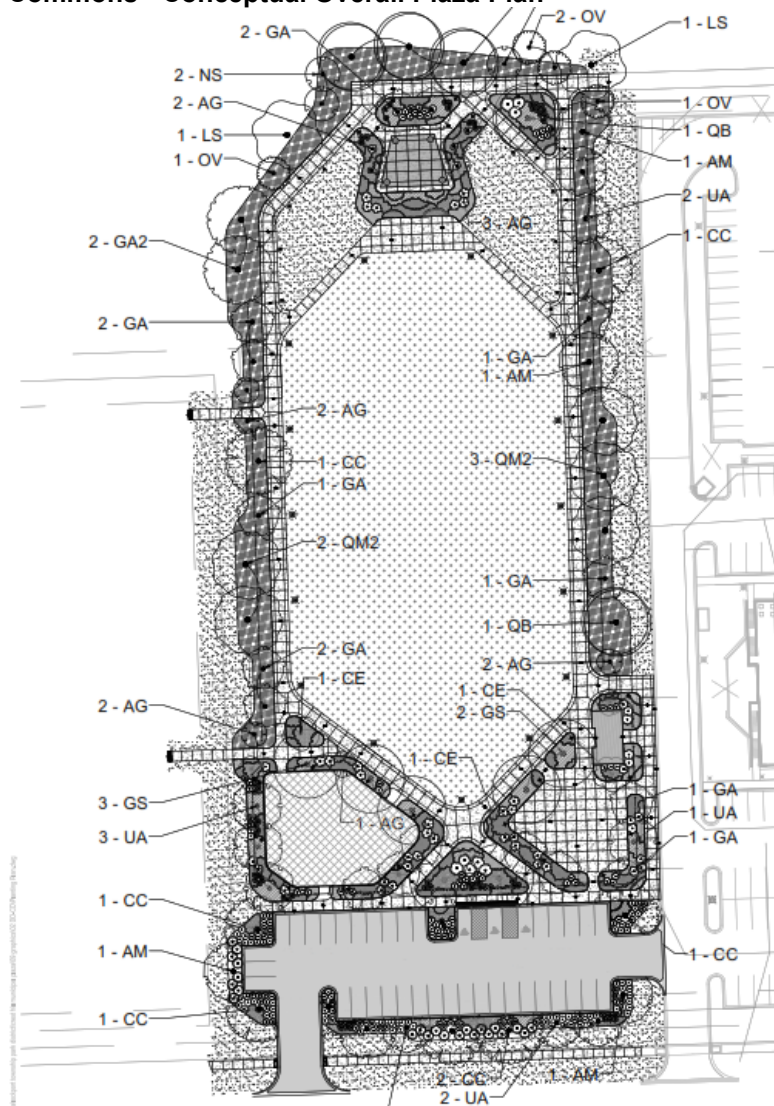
Crest Hill Commons - Conceptual Phase 1 Plaza Plan
